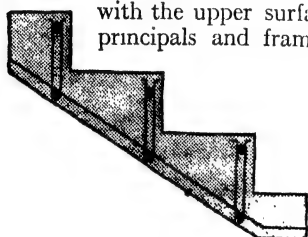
Mouchel-Hennebique Reinforced Concrete Stairs.
